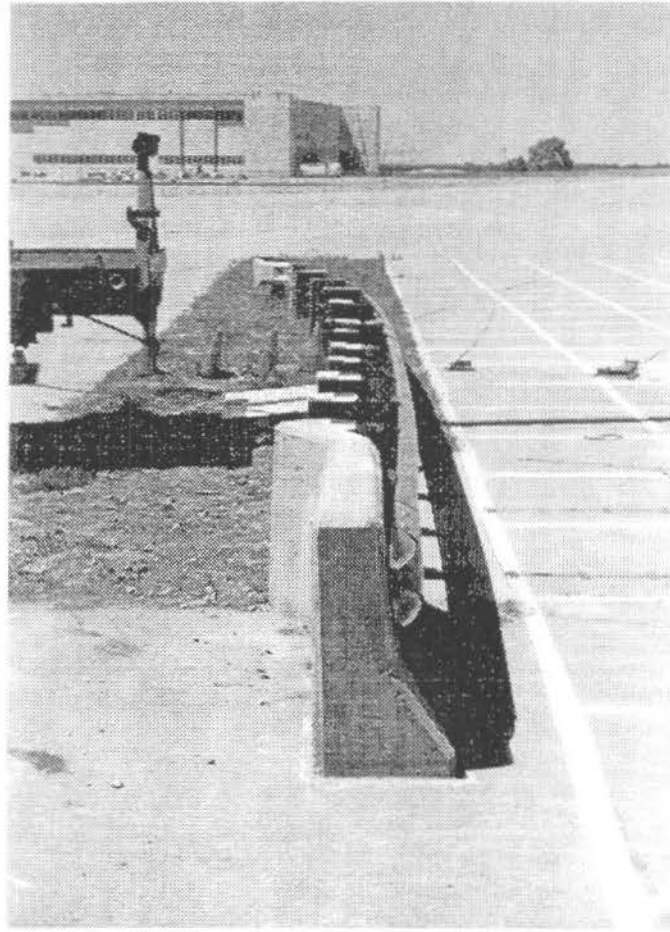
PHOTOGRAPHS OF W-BEAM APPROACH GUARDRAIL INSTALLATION.
